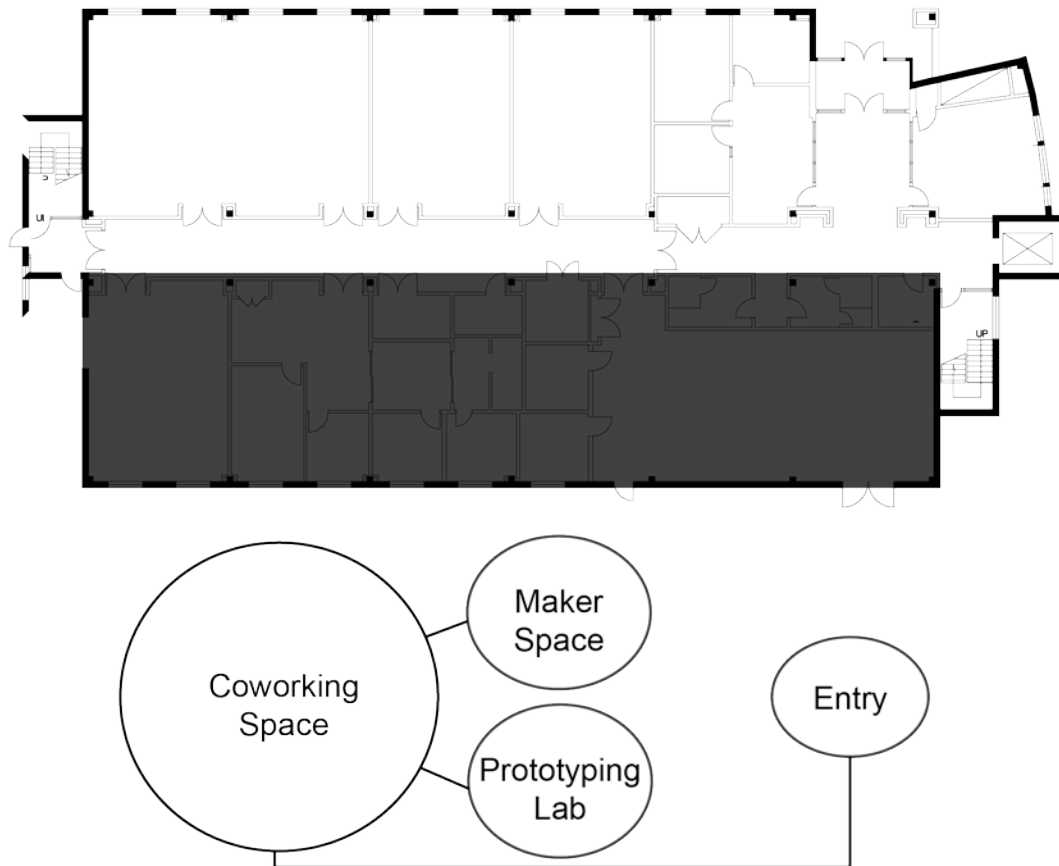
Start-Up Shell's floor plan at UMD's Technology Advancement Building (source: author)
